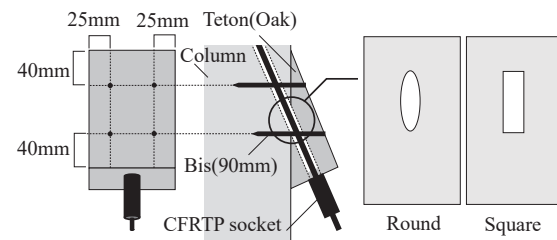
How to fix a corbel and The shape of hole of CF RTP
